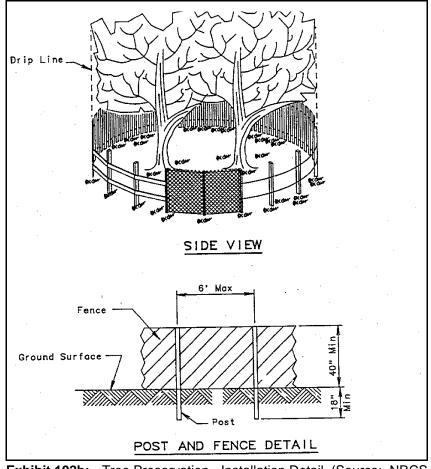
Tree Preservation - Installation Detail (Source: NRCS Files)
